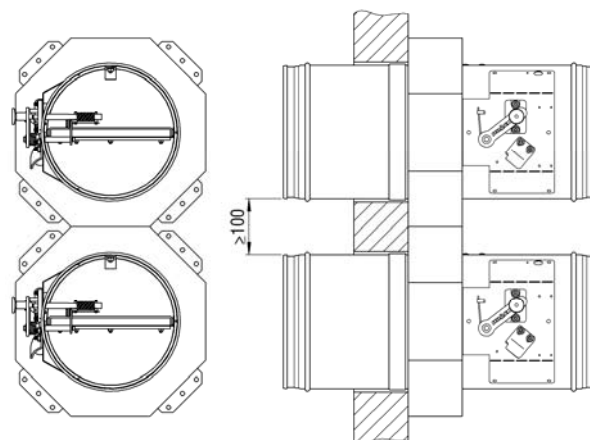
Dry installation on solid walls, BSK-RPR nominal size ≤ 250 – minimum distance from one another
